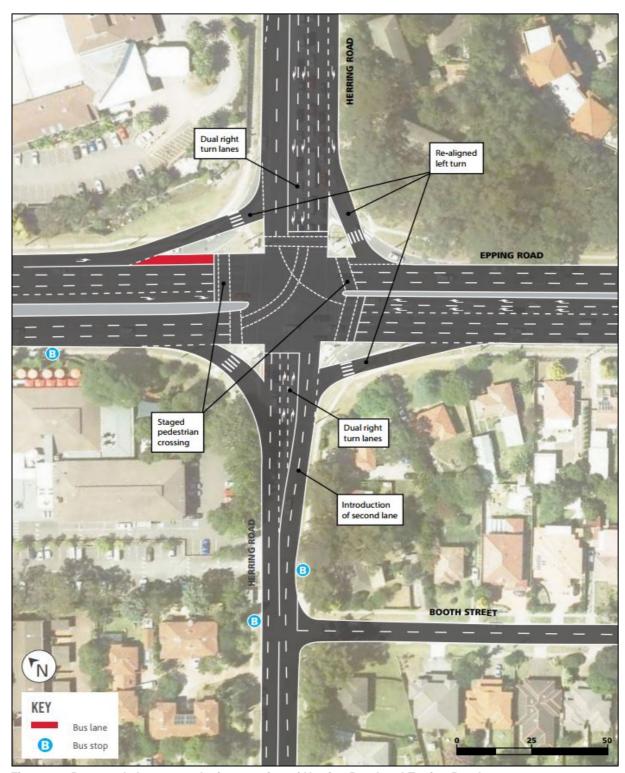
Proposed changes at the intersection of Herring Road and Epping Road
